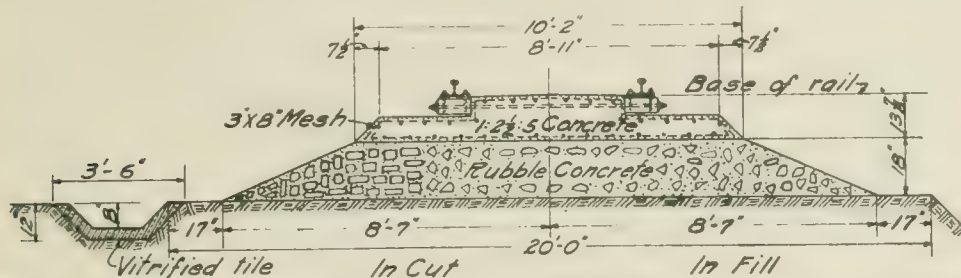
CONCRETE RAILWAY TRACK CONSTRUCTION PROPOSED BY J. W. SCHAU, 1905.
